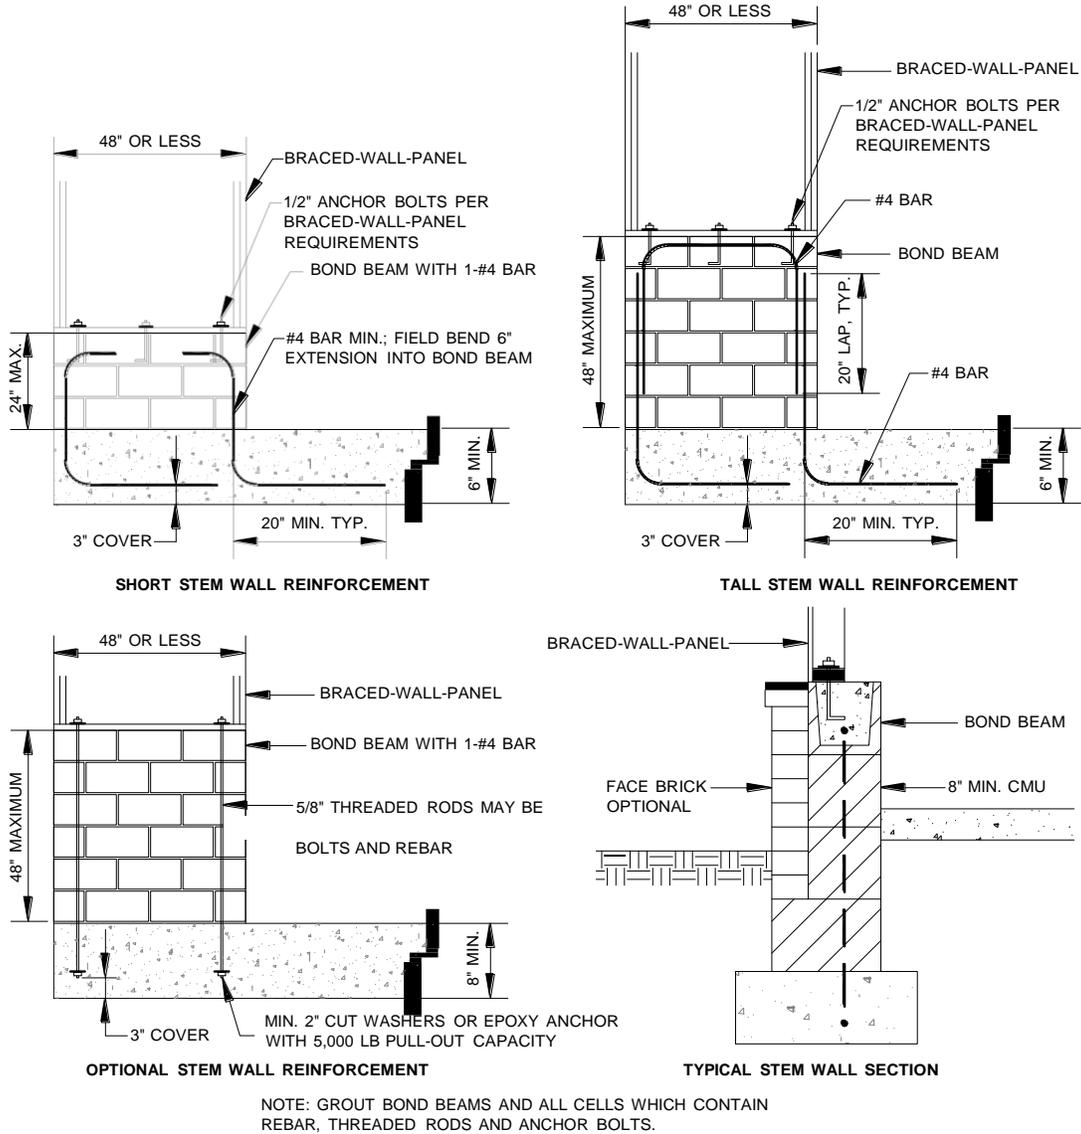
MASONRY STEM WALLS SUPPORTING BRACED-WALL-PANELS
